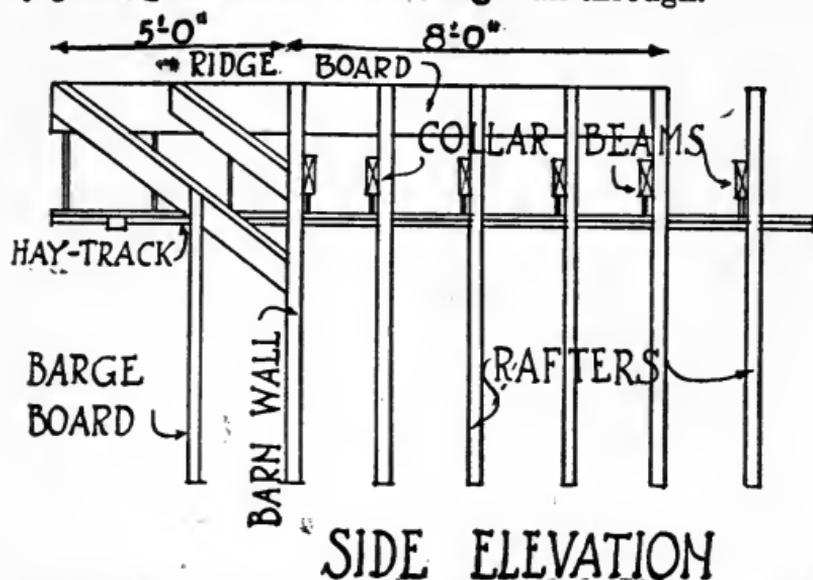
Side View Showing Plan for Building a Hayfork Hood to Project from Peak of a Storage Barn. The Jack-Rafters form a Brace to Support the End of the Hay-Track Beam
